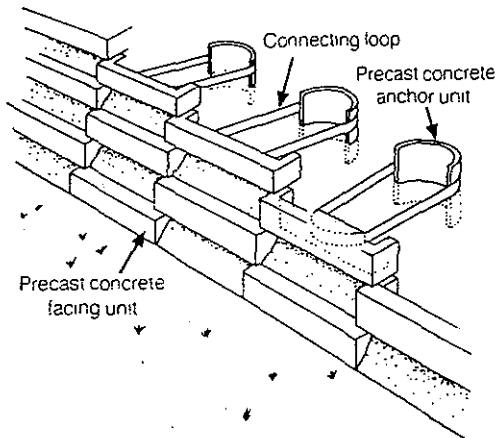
(c) Use of concrete blocks, polymer strips and anchors (Austrian system)
